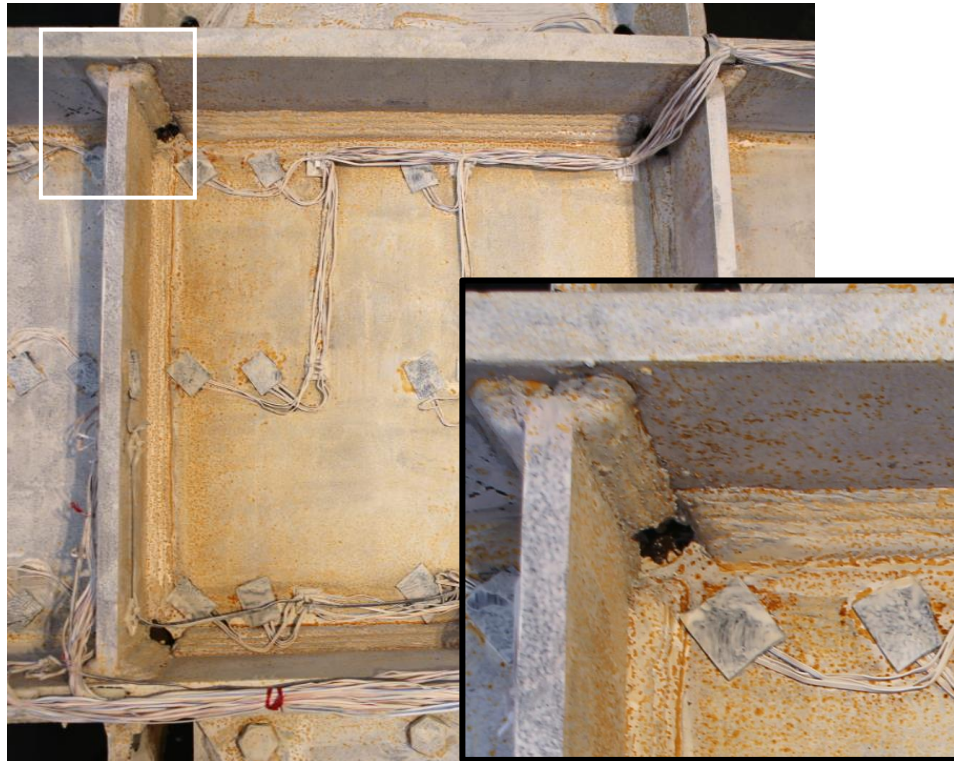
Specimen W4: Panel Zone (End of Test)
